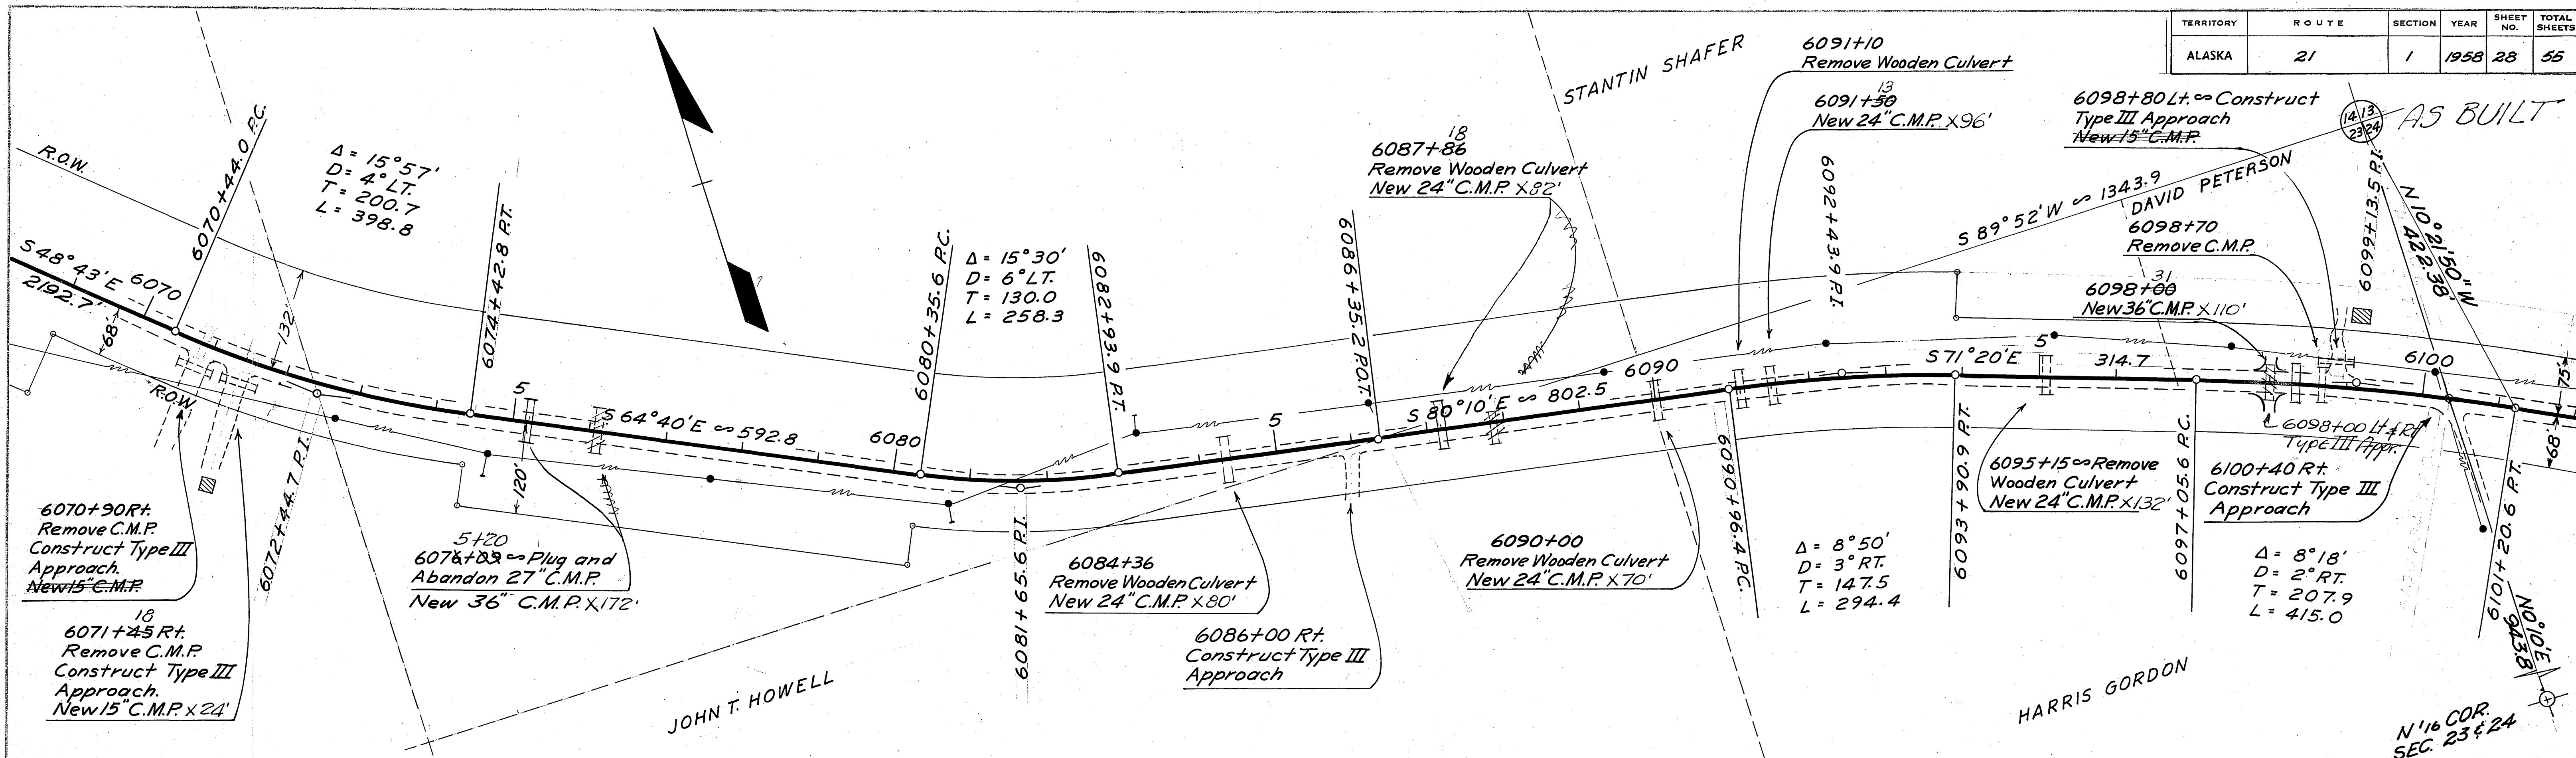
PLAN - PROFILE D. P. R. & E. STANDARD
